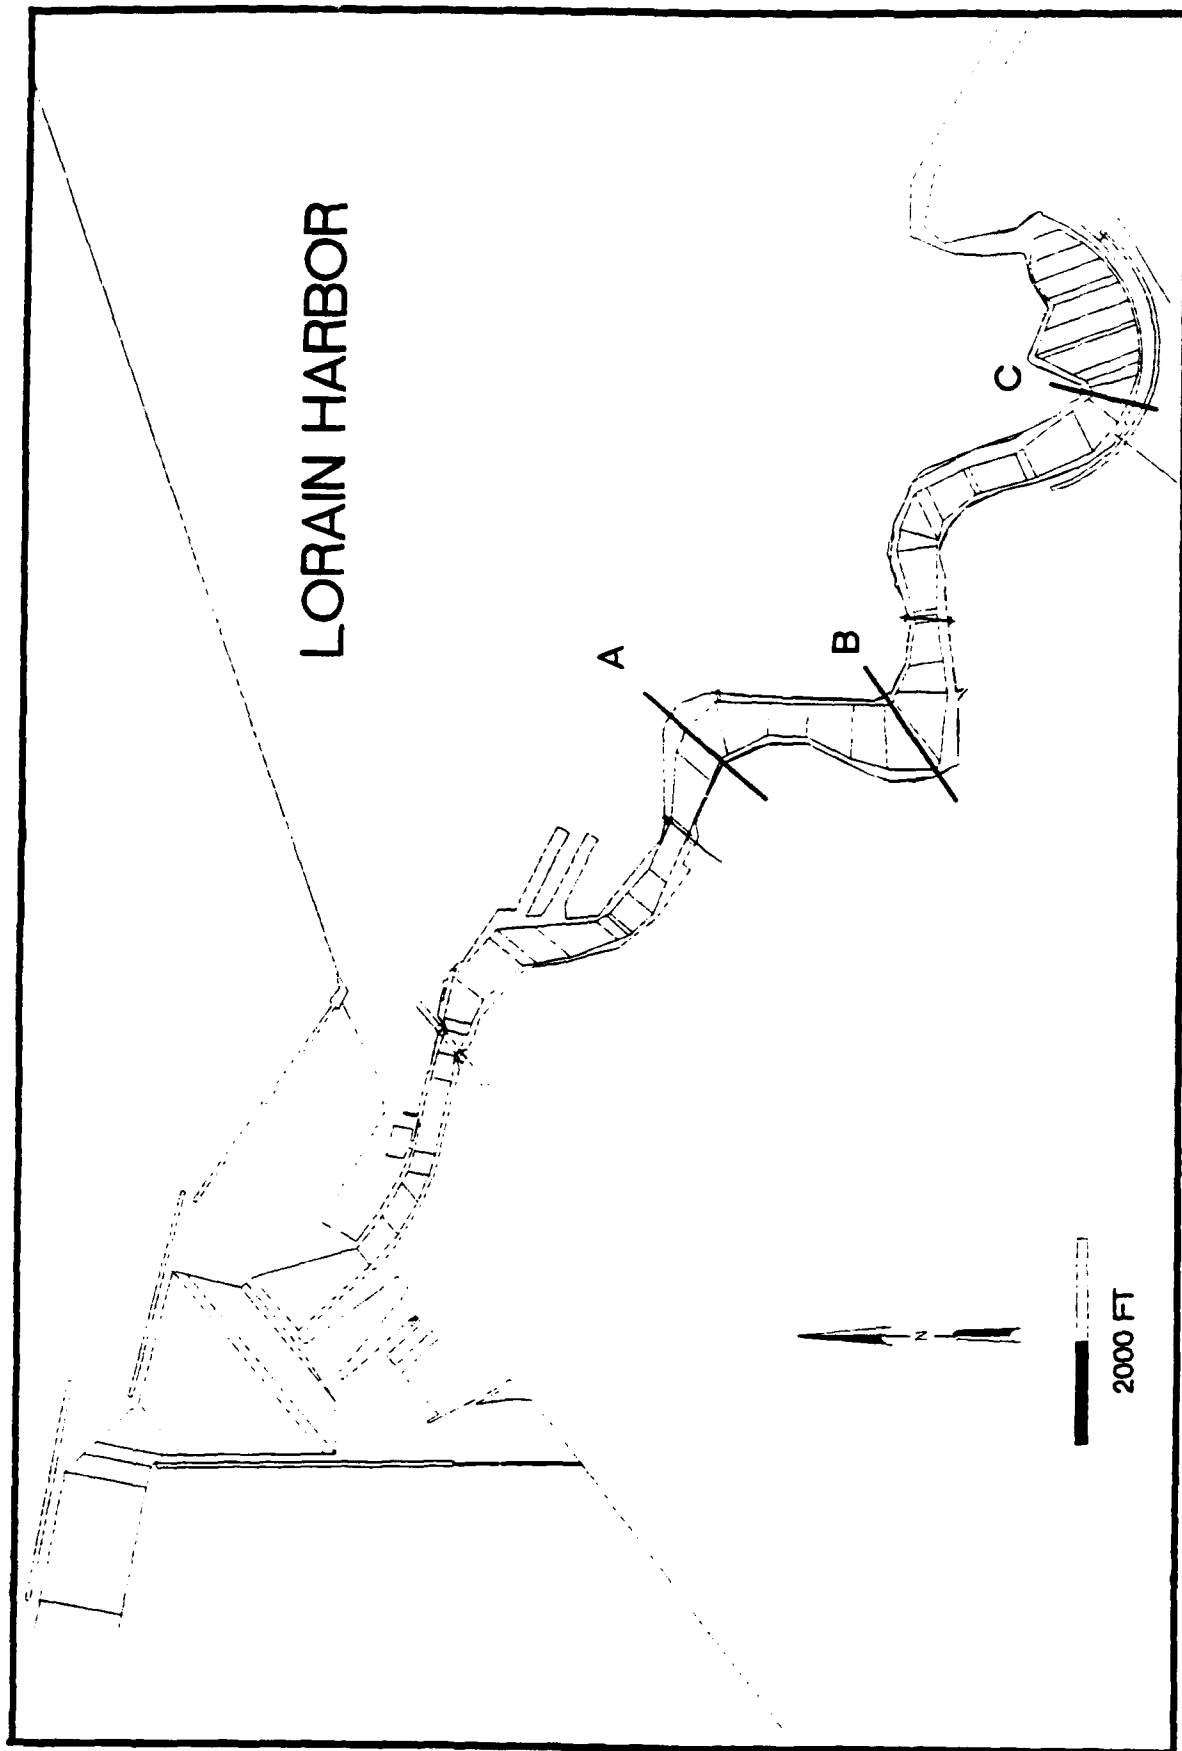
Locations of typical cross sections at each of the proposed bank cuts
